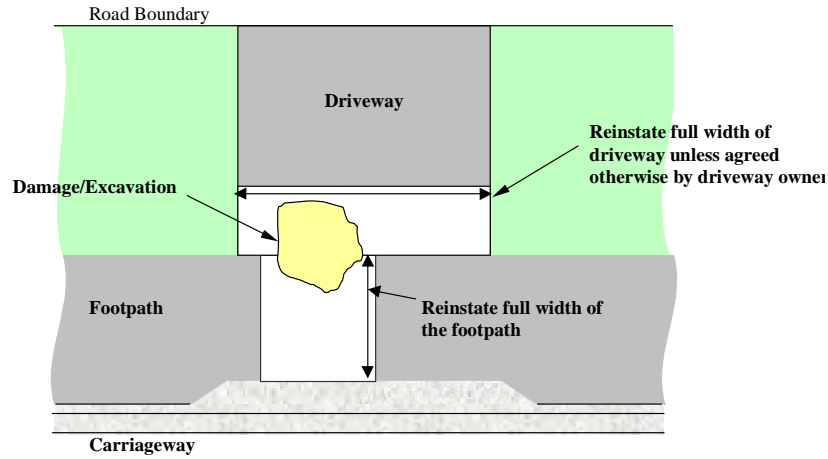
Excavation/Damage in footpath or driveway
